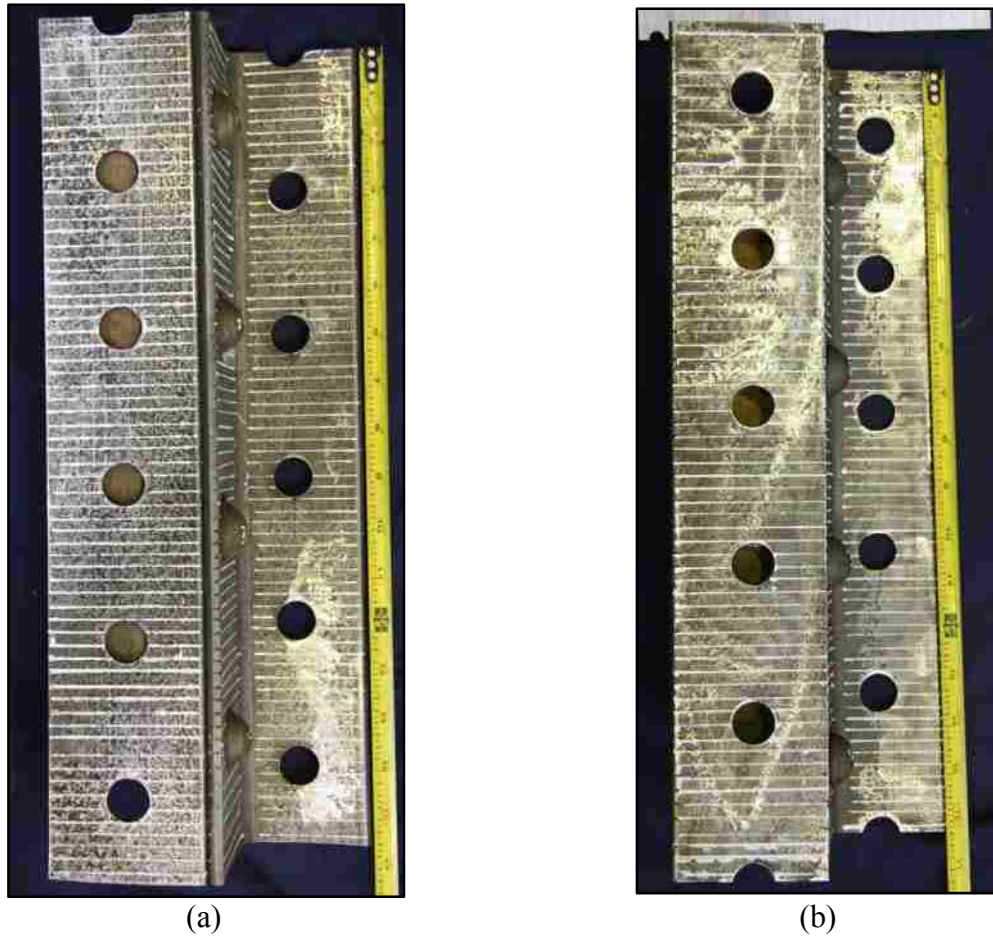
Horizontal Grid on (a) West Guardrail (Part 4) and (b) East Guardrail (Part 5)
